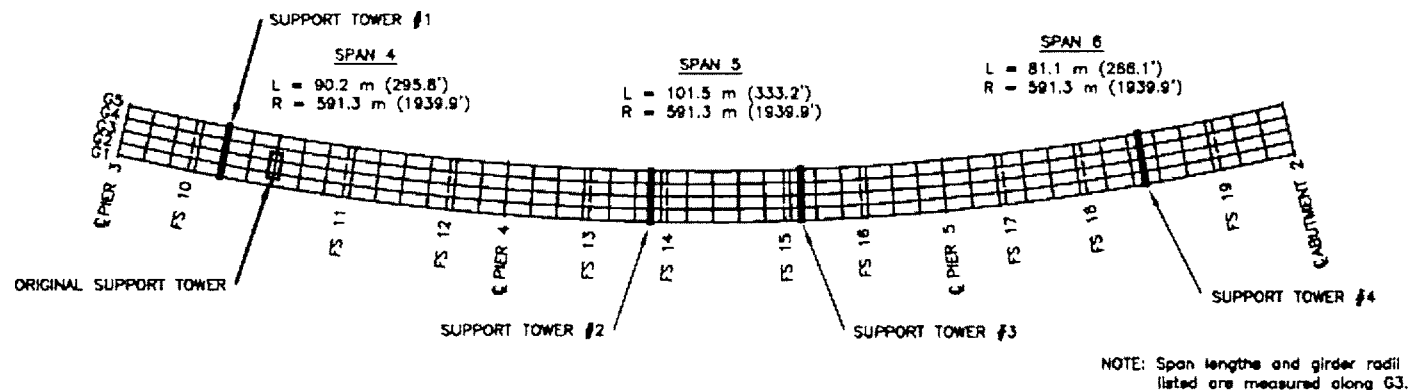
Framing plan of Spans 4–6 detailing girder numbers, substructure units and field splice, and support tower location
